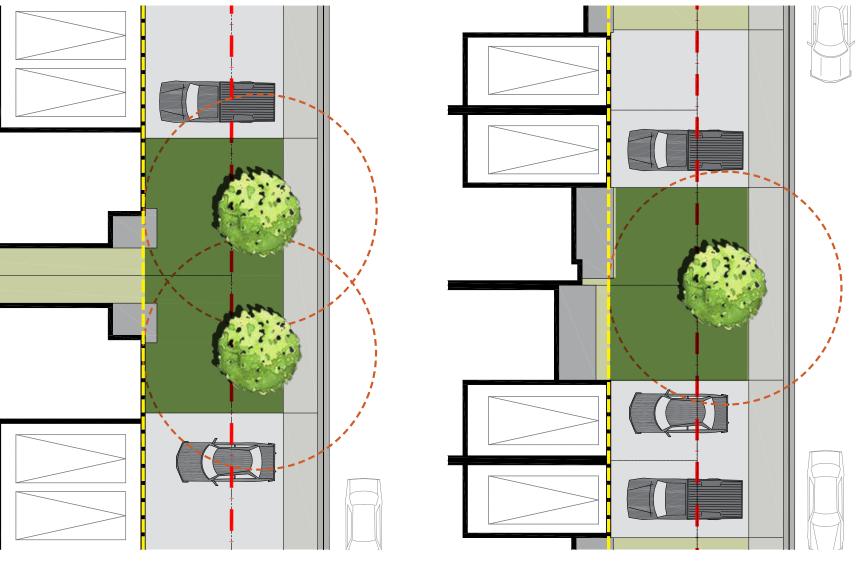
Tree Planting Setback - 42' Front Drive Singles
